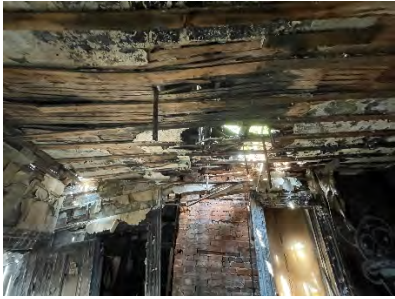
Interior view of the house showing the collapsed second floor. The second floor has collapsed down to the basement in the main portion of the house.
